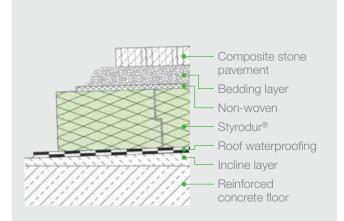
Parking roof design with composite stone pavement on a bedding layer.
